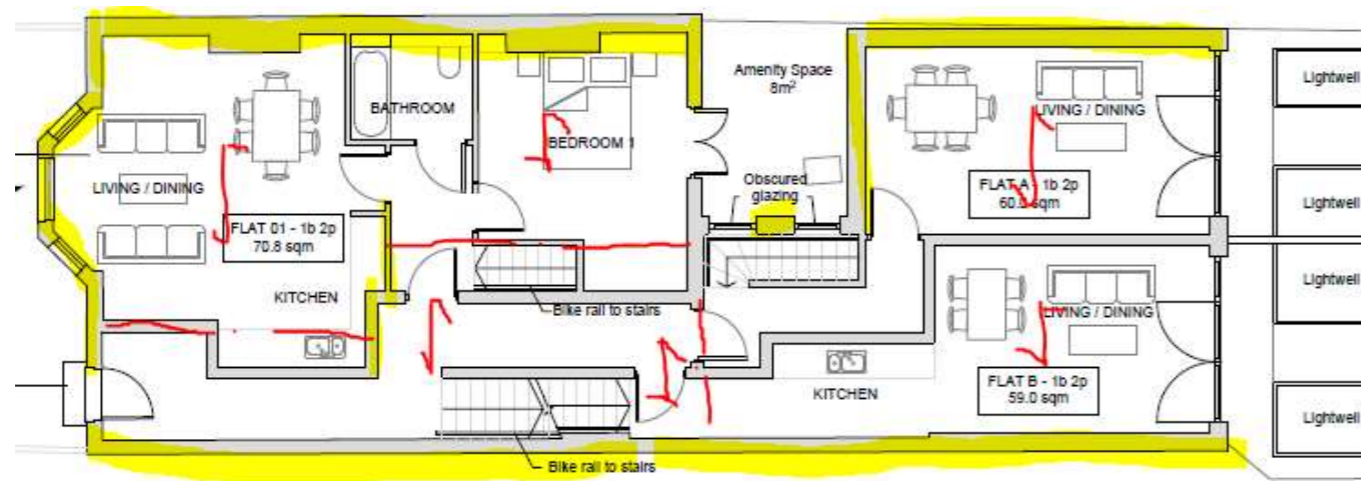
Assumed ground floor showing span of 1st floor over and steel beam over
